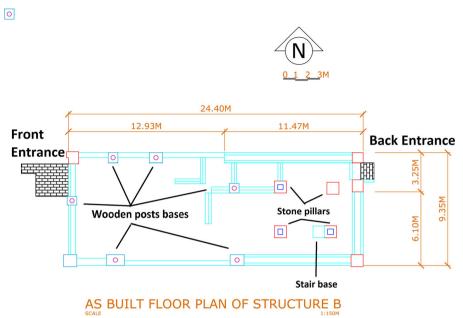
First floor plan of Structure B (modified after plan prepared by Angel Sales)
